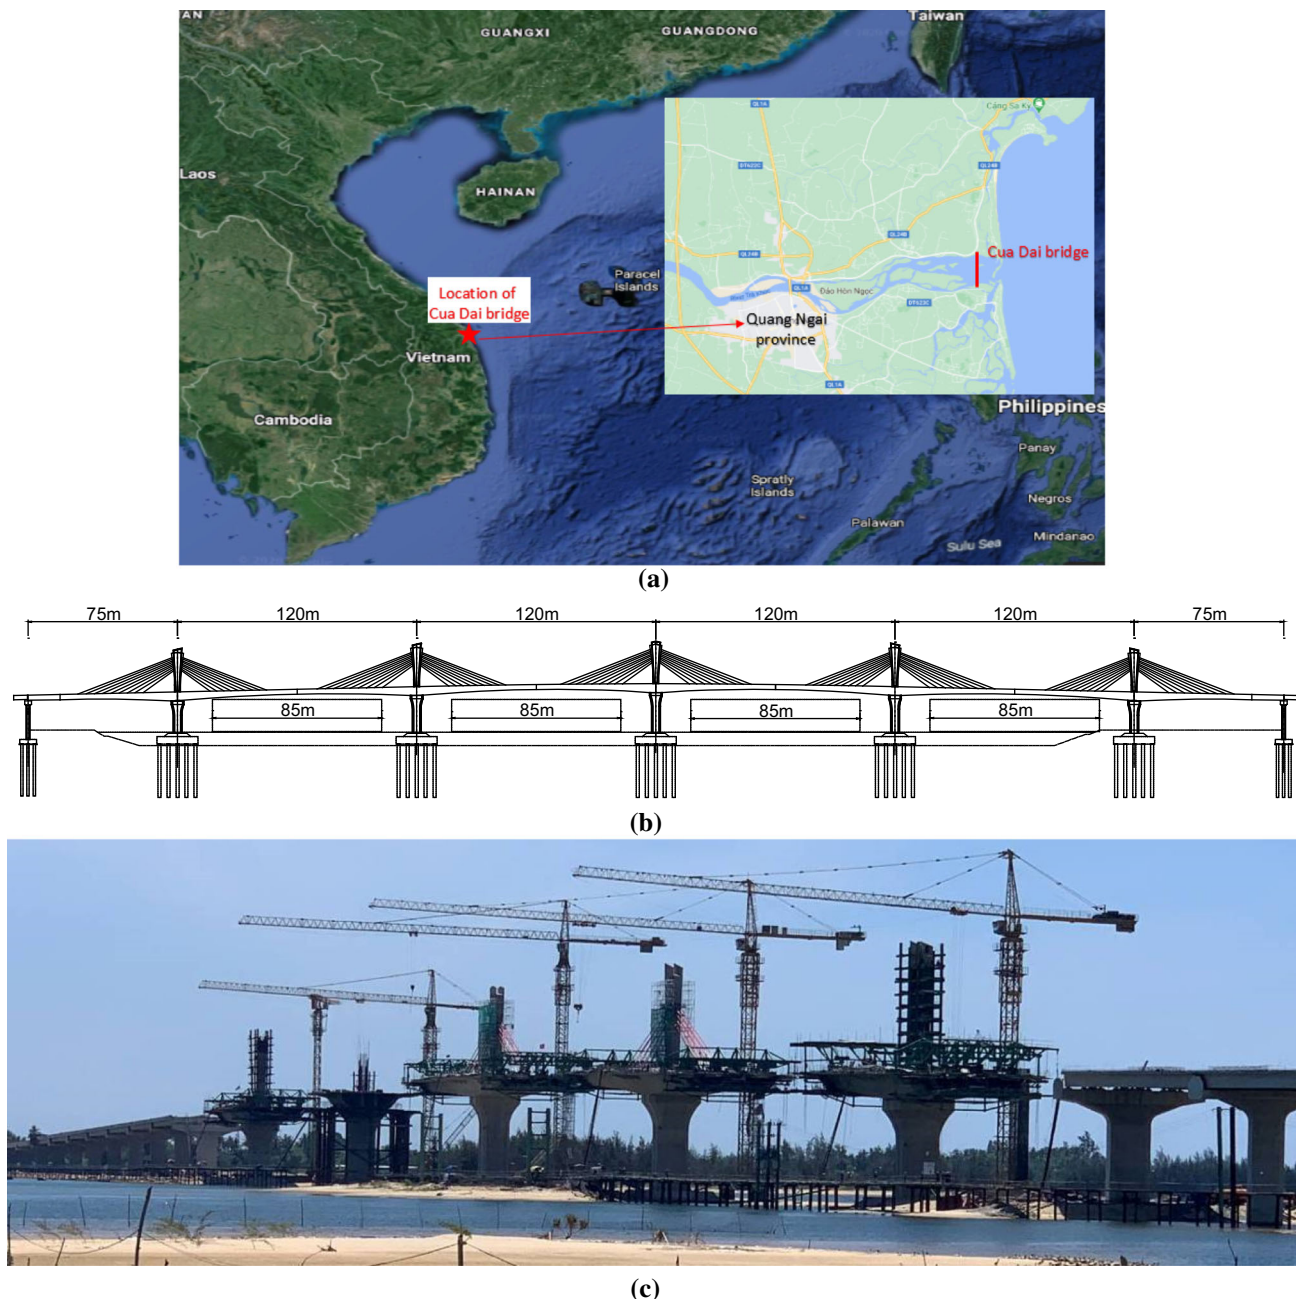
Basic information of Cua Dai bridge: a location of the bridge in Vietnam, b design of Cua Dai bridge, and c Cua Dai bridge under construction
